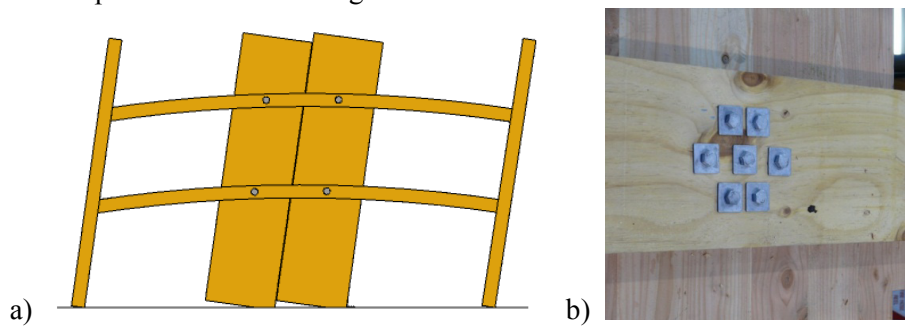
a) Representation of the behaviour of the loading beams for the Low Seismic option, as uplift occurs in the walls, b) pinned connection between loading beams and walls.
